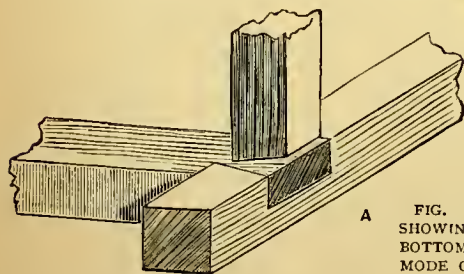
DIAGRAM SHOWING CORNER OF BOTTOM FRAME, AND MODE OF JOINING THE PARTS.
